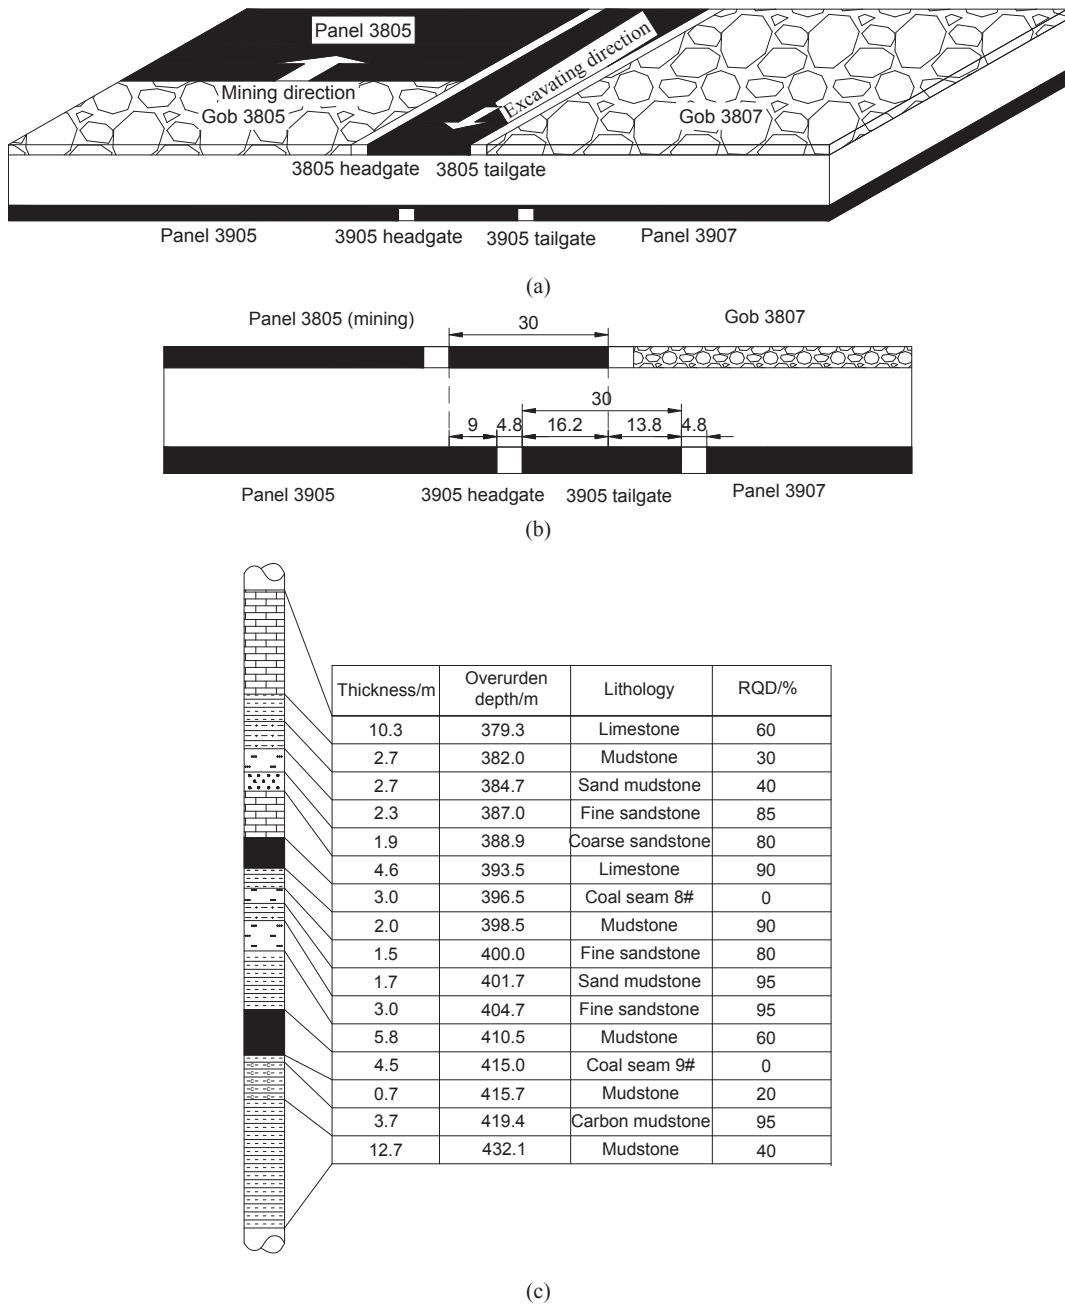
Schematic diagram of the multi-seam mining layout and geological column settings. (a) Schematic diagram of the multi-seam mining layout; (b) Plan view of the multi-seam mining layout (unit:m); (c) Geological column settings.
